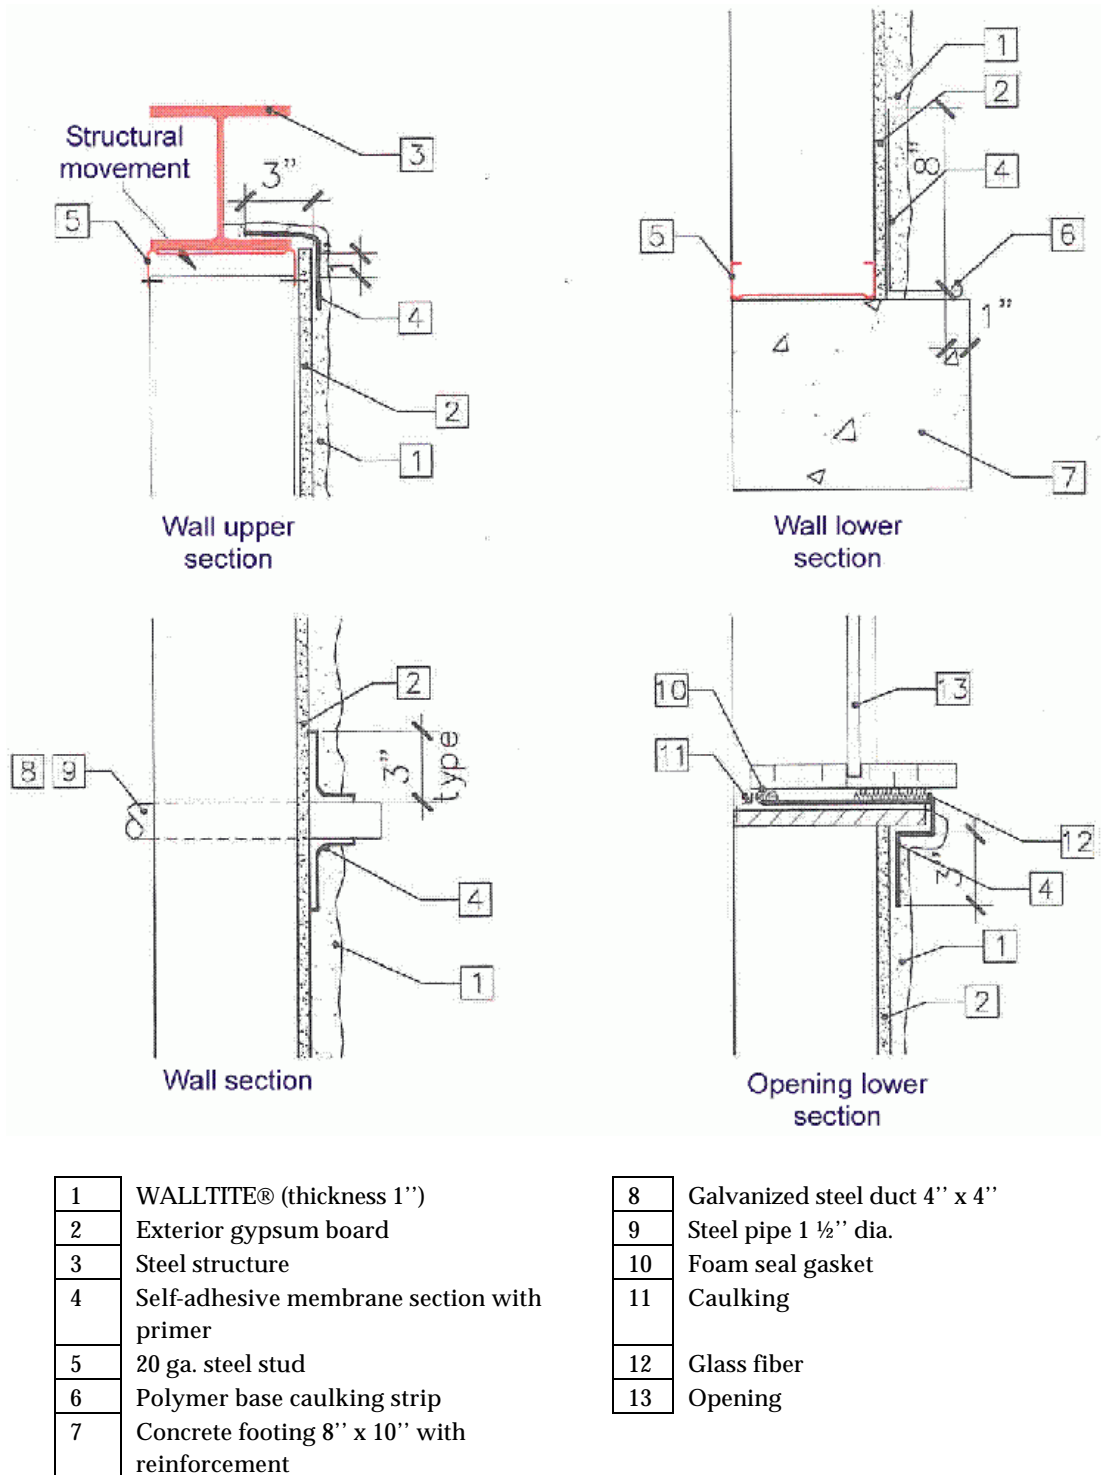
Transition Membrane Details ³/₄ at joints of exterior sheathing wall and penetrations
